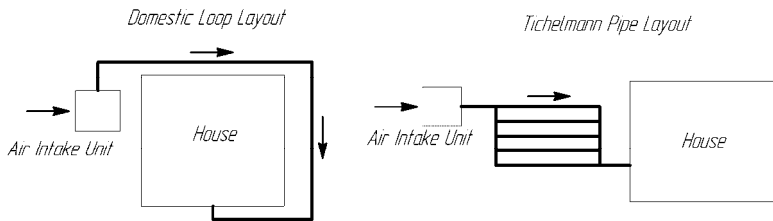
Options for placement of horizontal ground-air heat exchangers of geothermal ventilation [2]
